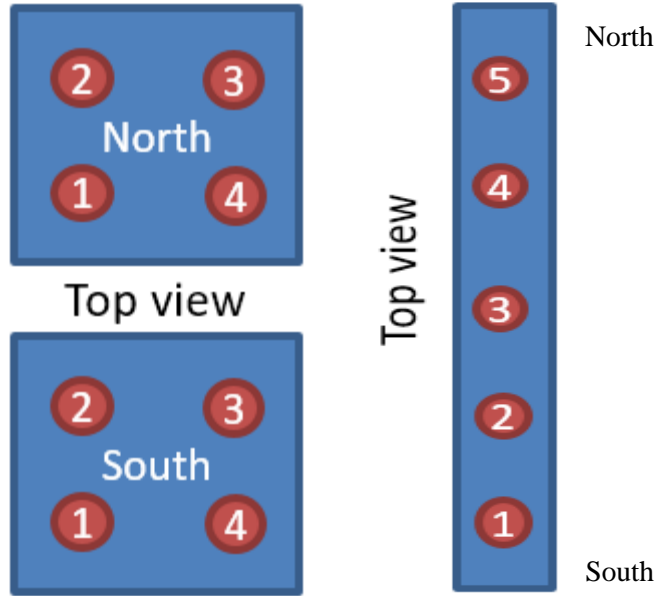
Location of Piles at Piers and Abutments: Pier (Left) and Abutment (Right)
